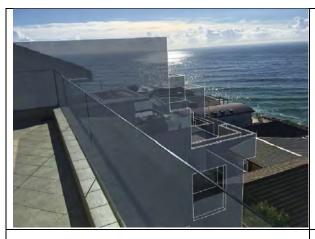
Photomontage of affected view from upper level balcony looking east from 103 Hewlett Street
